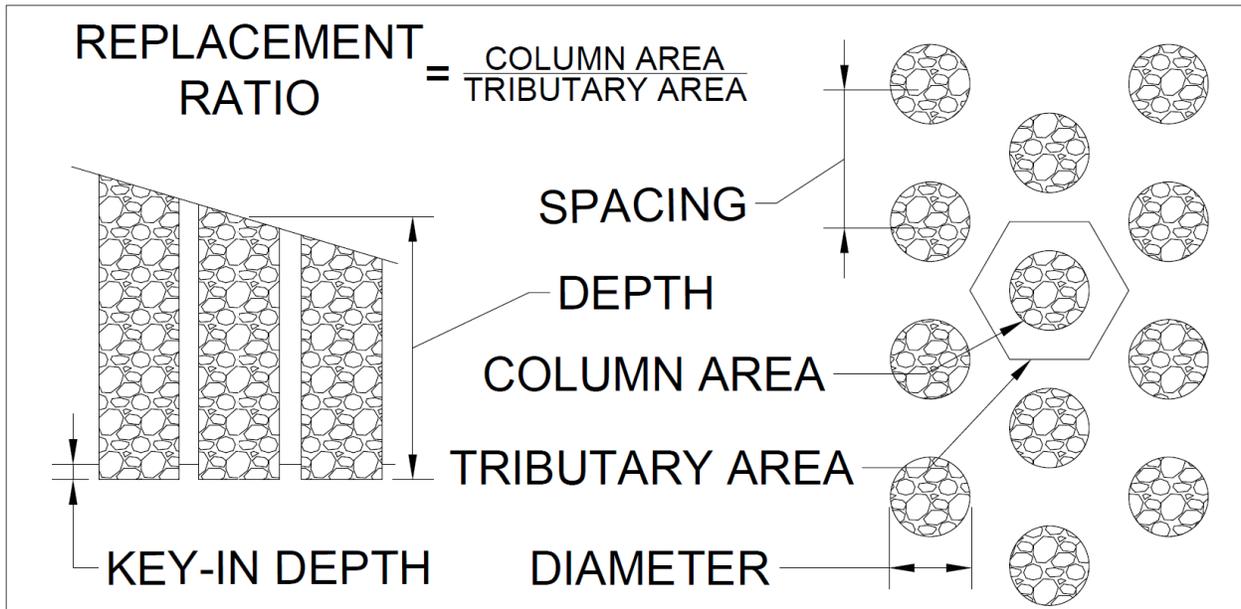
Key dimensions relating to rockfill column shear keys are labelled in cross-section (left) and plan view (right).
